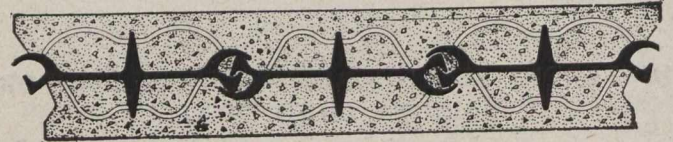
Method of Protecting the Centre Flange Type With Concrete.
